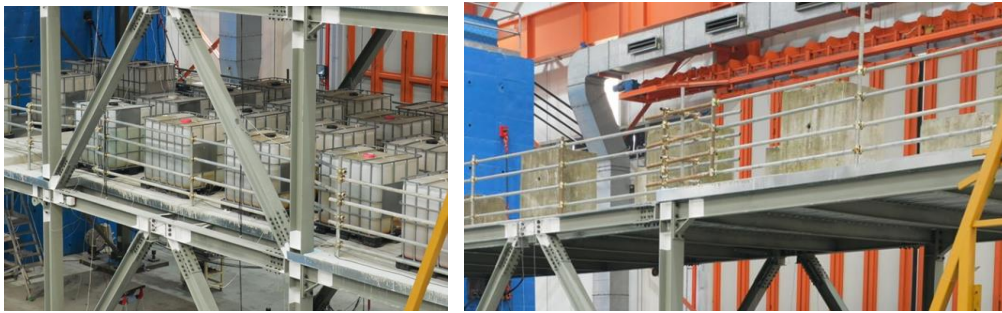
Arrangement of water tanks and concrete blocks on the specimen
